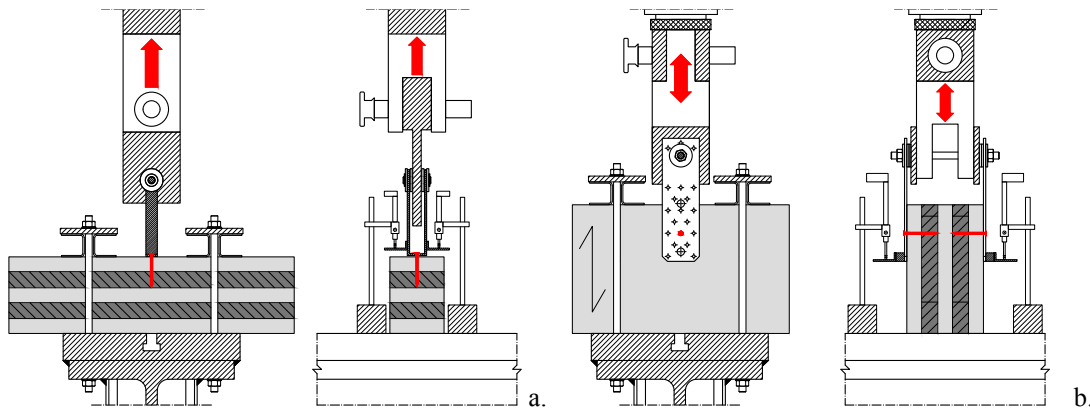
Test configurations for single fastener joint tests: (a) nail withdrawal tests (left: front view, right: side view) and (b) joint shear tests (left: front view, right: side view).
